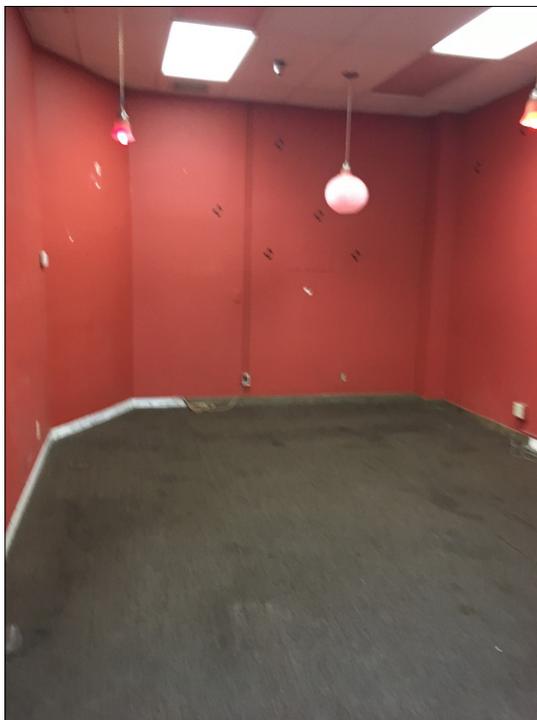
Subject property, Building C, interior, west unit, view southeast (McGee, 2017)
